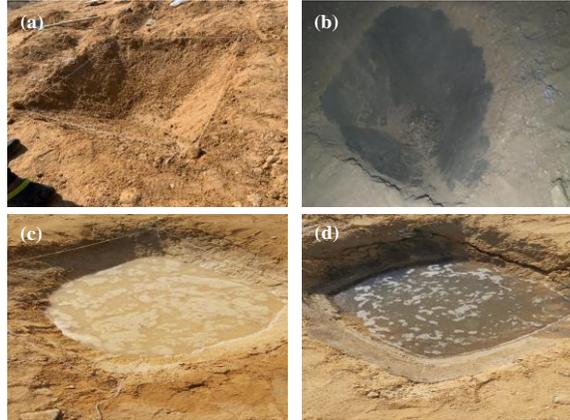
(a) sand pit; (b) sludge pit; (c) sand pit with water; and (d) sludge pit with water
